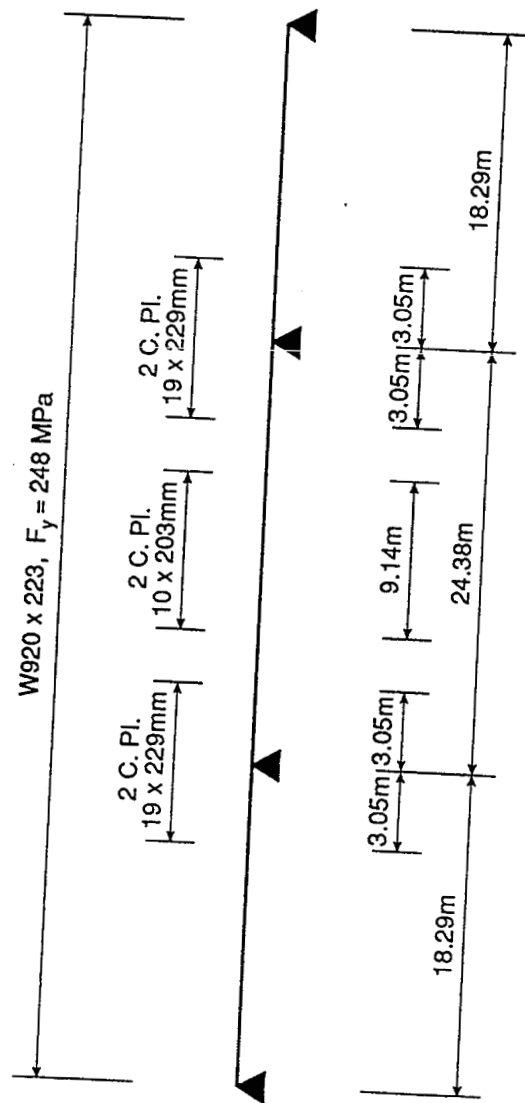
Girder Details for the 3-Span Continuous Bridge in Tuscaloosa County
